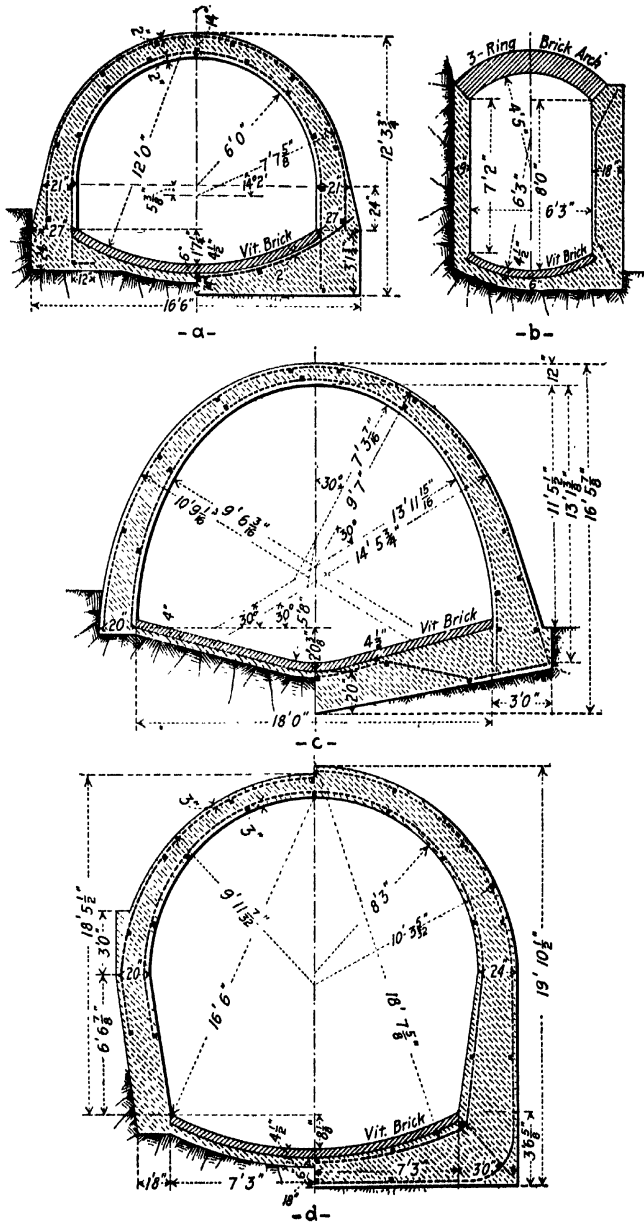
St. Louis, Mo., Baden Public Sewer, First Section, 1910. Five-centered, or semi-elliptical arch section, 18 ft.  $\times$  13 ft. 1-3/8 in. Left half, construction in rock cut; right half, type for earth cut. Transverse extrados reinforcing bars, 3/4 in. square, 10 in. c. to c., transverse intrados bars, 1/2 sq. in., 20 in. c. to c. W. W. Horner states that use of this type instead of that shown in Fig. 165a, has been a matter of judgment in each particular case. The five-centered arch has been preferred where loading was principally uniform earth load.
